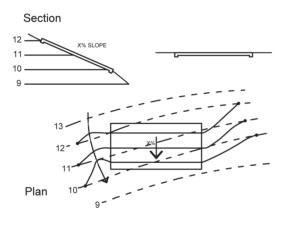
Grading using shallow swale draining water around a plain whose finish elevation is 14.0 m.
